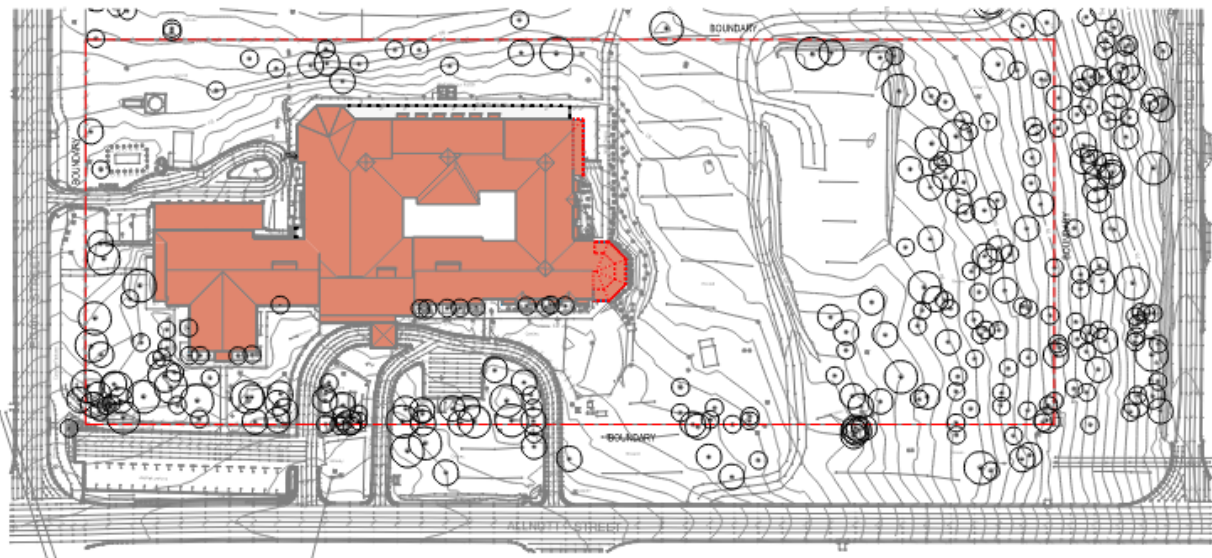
Existing Site Plan (DMG Architecture DA.01 A)
